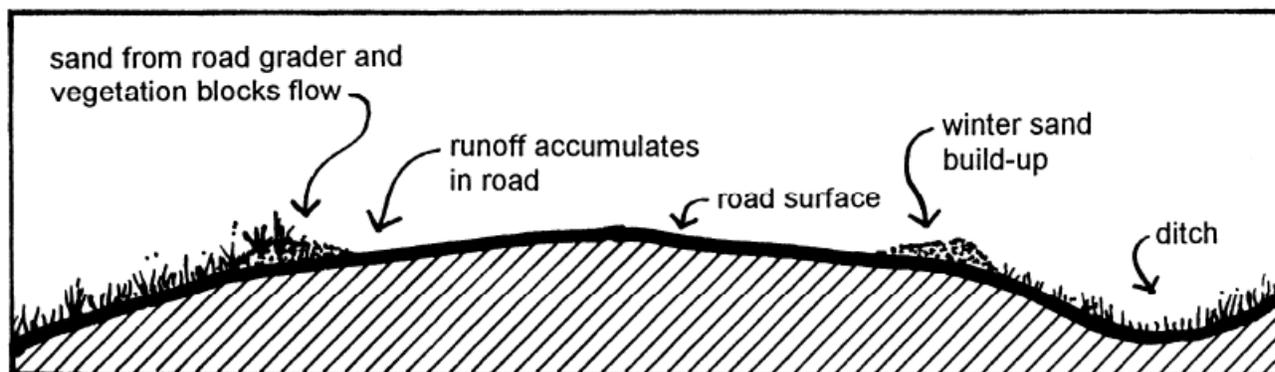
Sand and vegetation build-up prevents drainage to sides of road.
